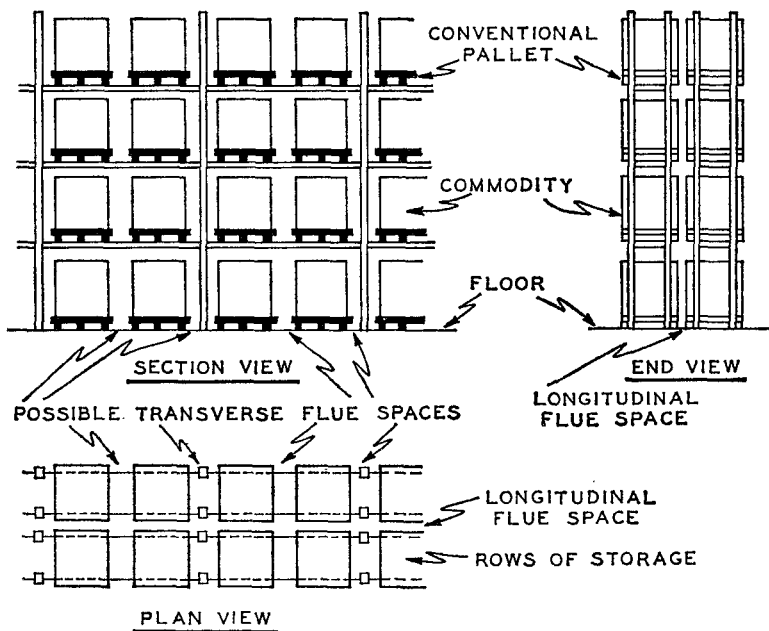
Typical Double Row (Back-to-Back) Rack Arrangement.
